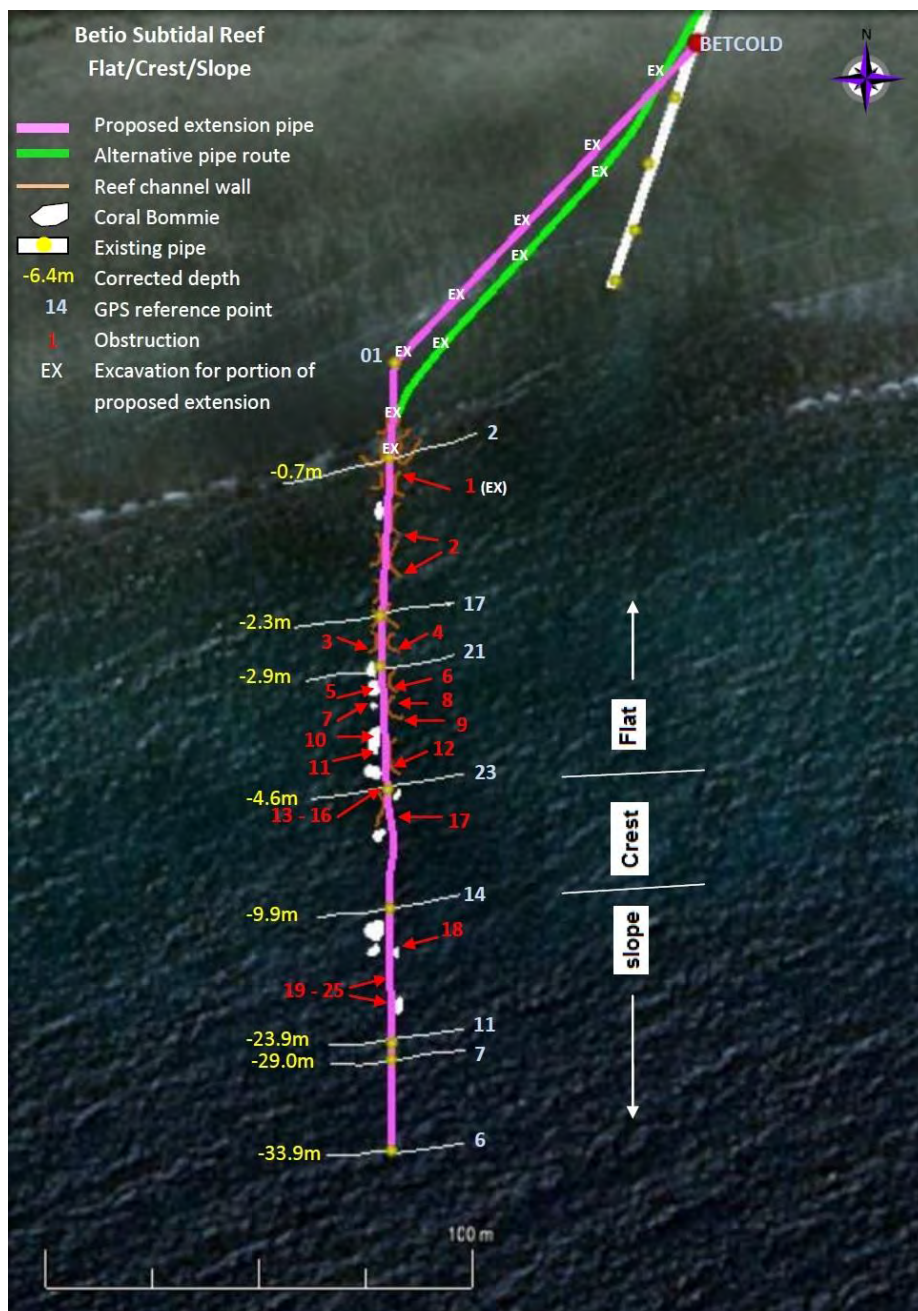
Features and Obstructions along the Existing and Proposed Betio Outfall Route (digitized by SMEC)
